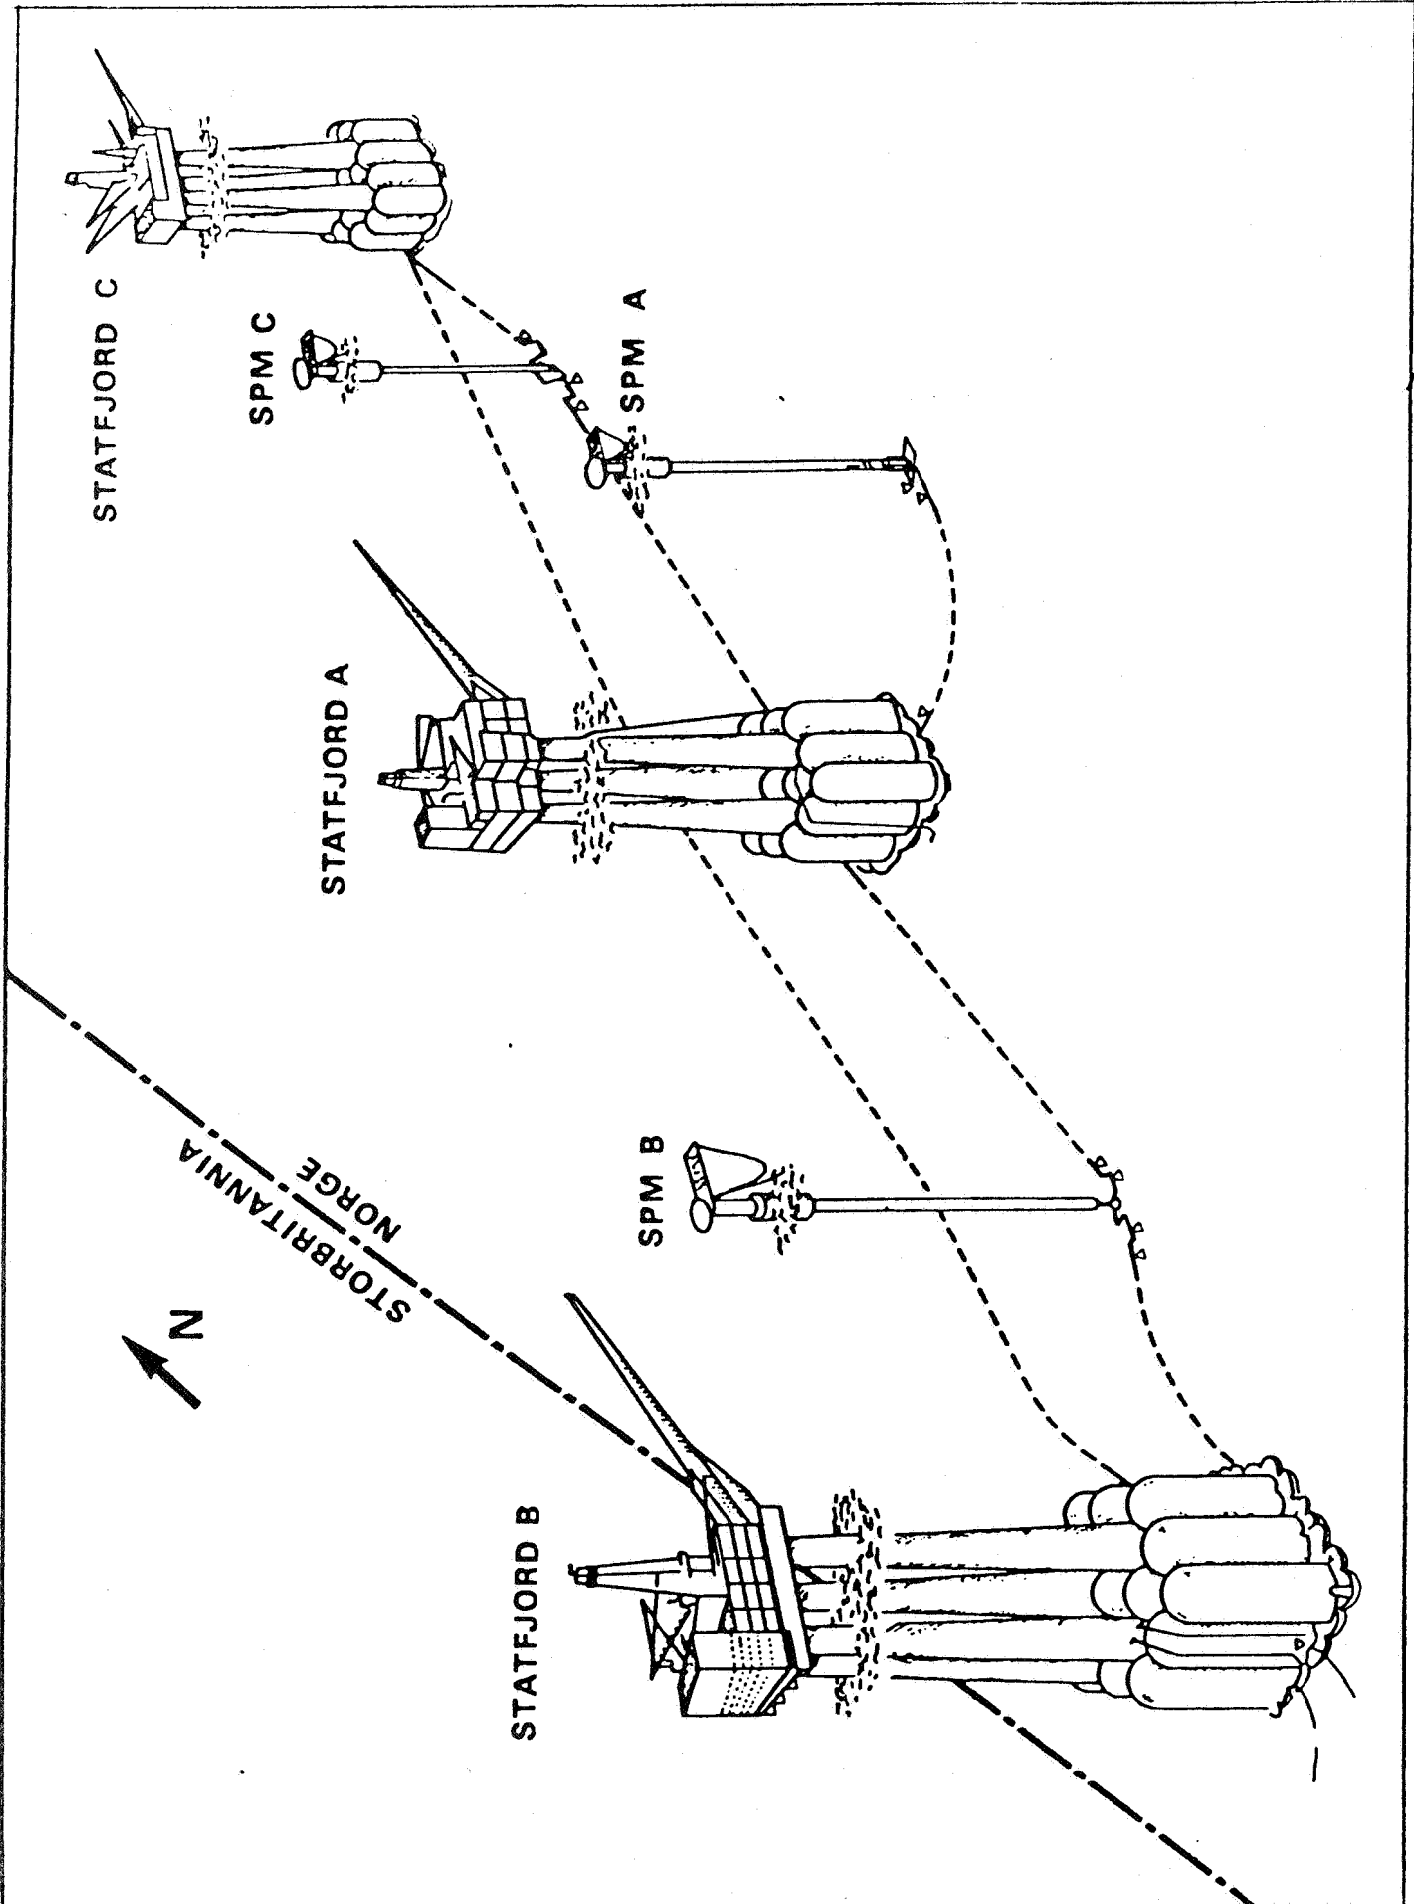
b. Existing and planned installations on the Statfjord field
